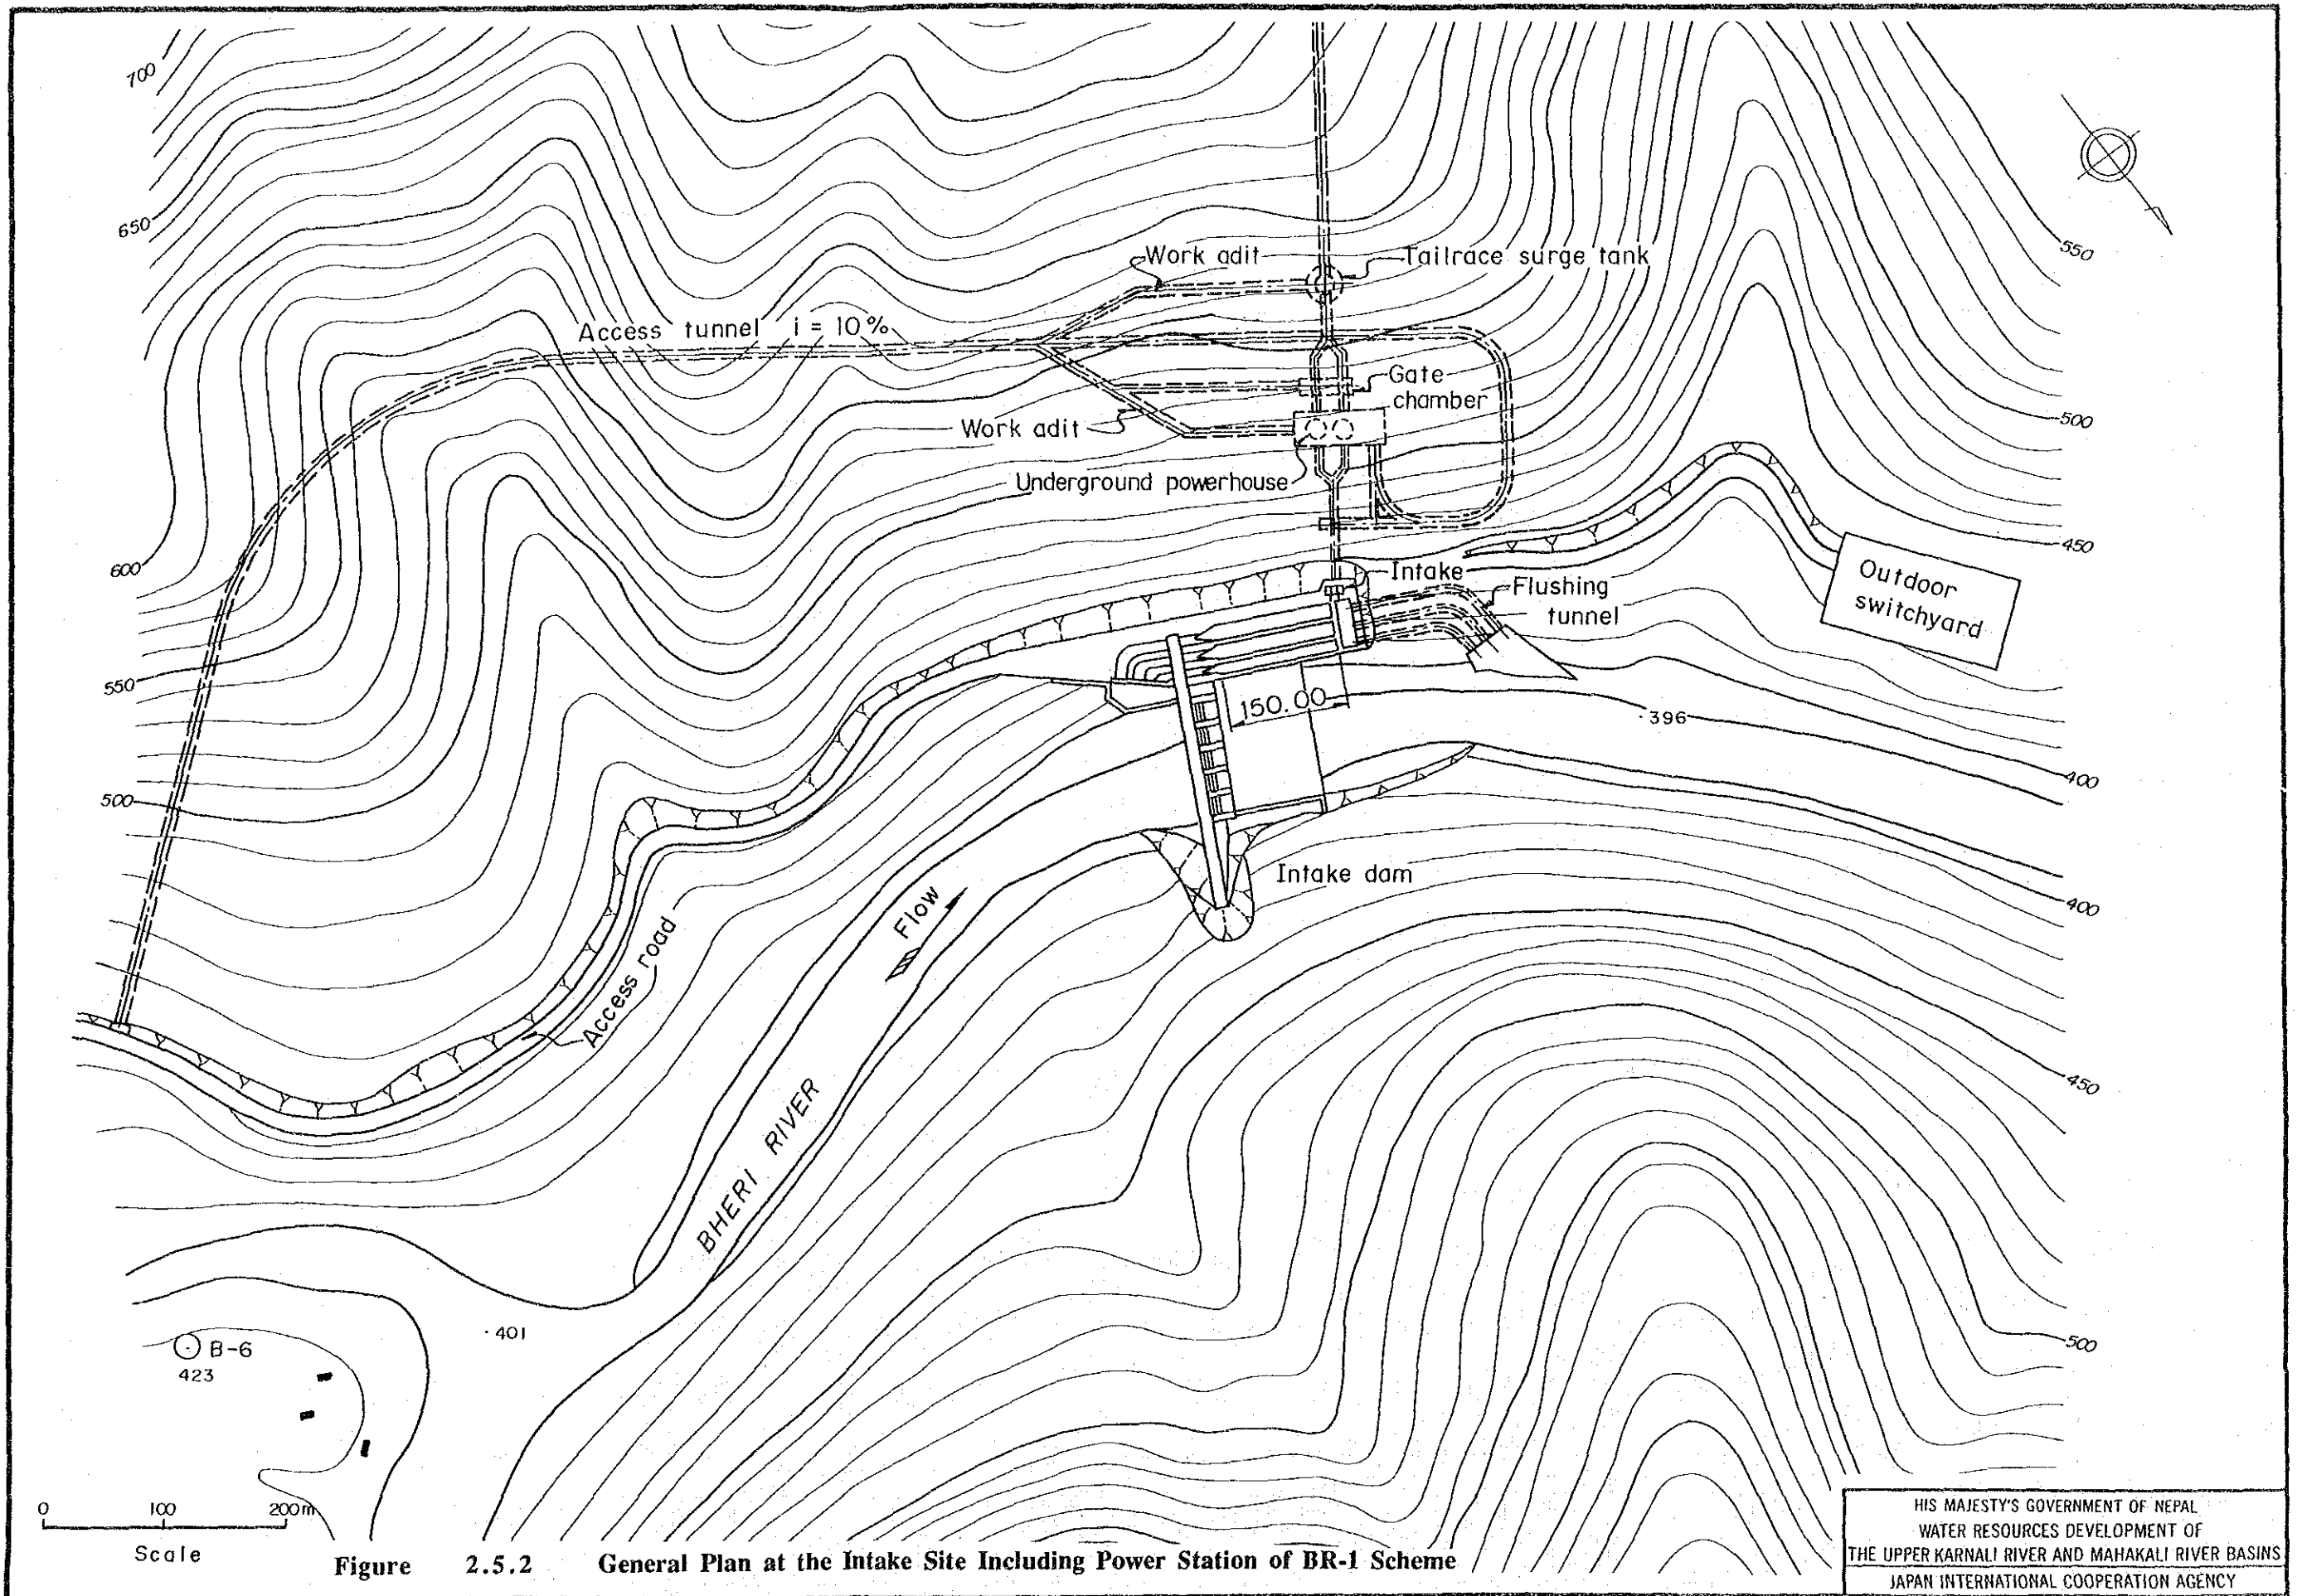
General Plan at the Intake Site Including Power Station of BR-1 Scheme
